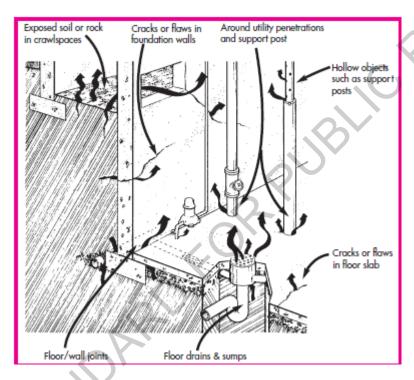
Potential entry points of radon in foundation walls and poured concrete floors
